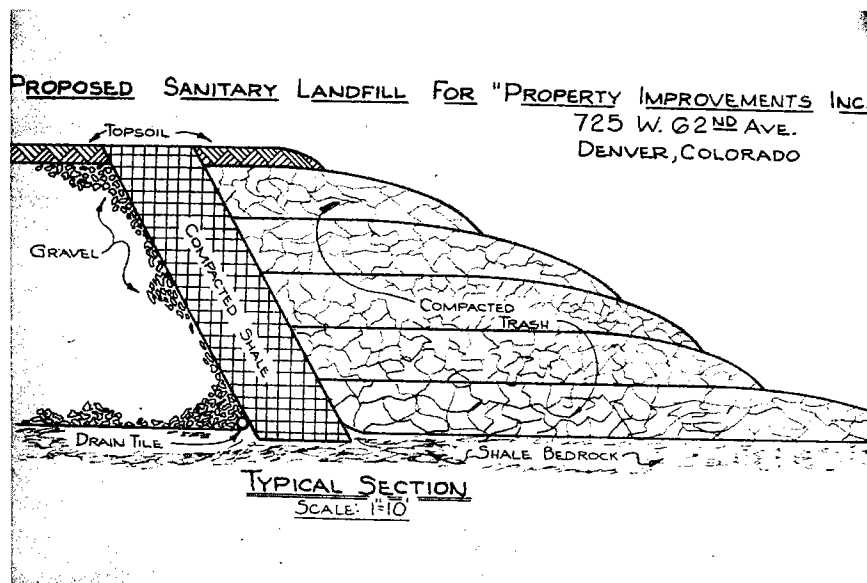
Typical cross section in trash disposal development. Drain tile as shown was installed only on upstream side of pit area to divert as much ground water as possible around the disposal site.
